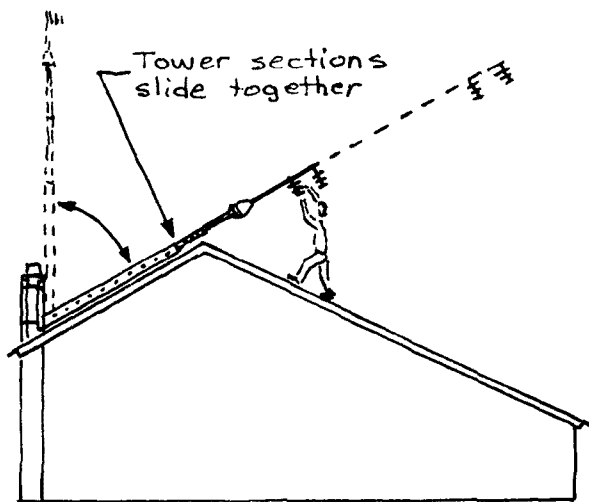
To reach antennas, simply remove bolts joining sections, sliding one section inside the other.
